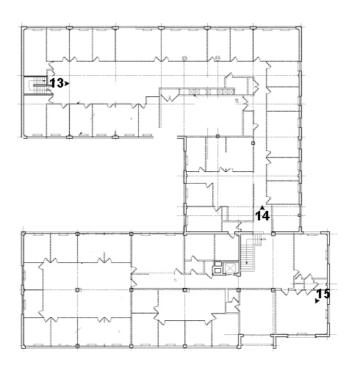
First Floor Photo Map. Source: El Dorado Inc., 2014. Not to scale.
